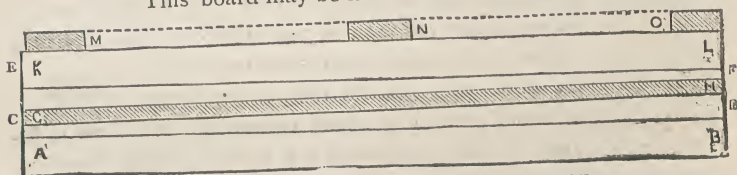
ELEVATION OF GUTTER AT THE BACK.
